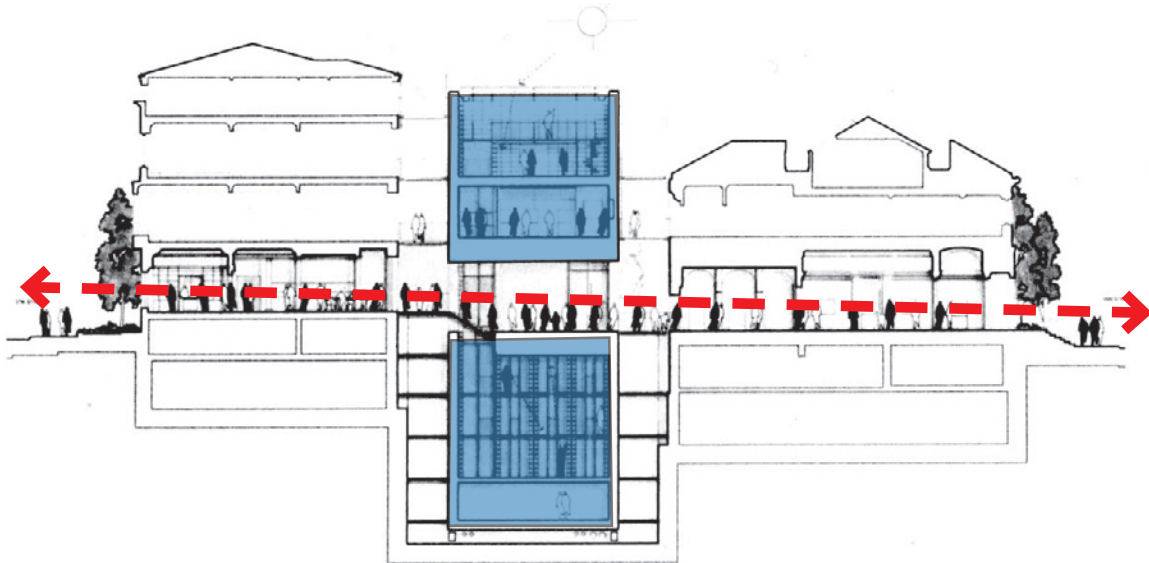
Piano's addition created new independent spaces, as well as continuous connection between existing spaces (Author)
